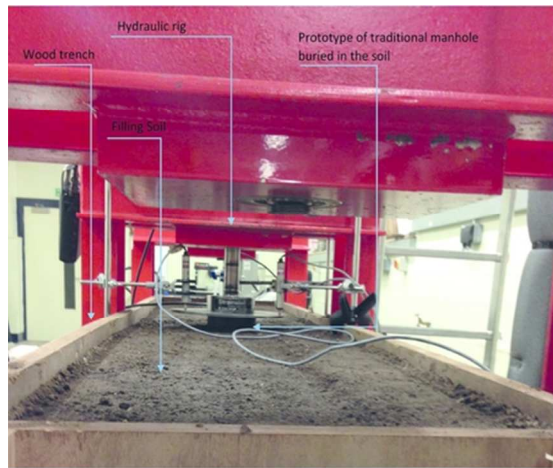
a. Setup of the trench in the rig and location of measurement instruments on the traditional manhole surface at three points on the edge.
